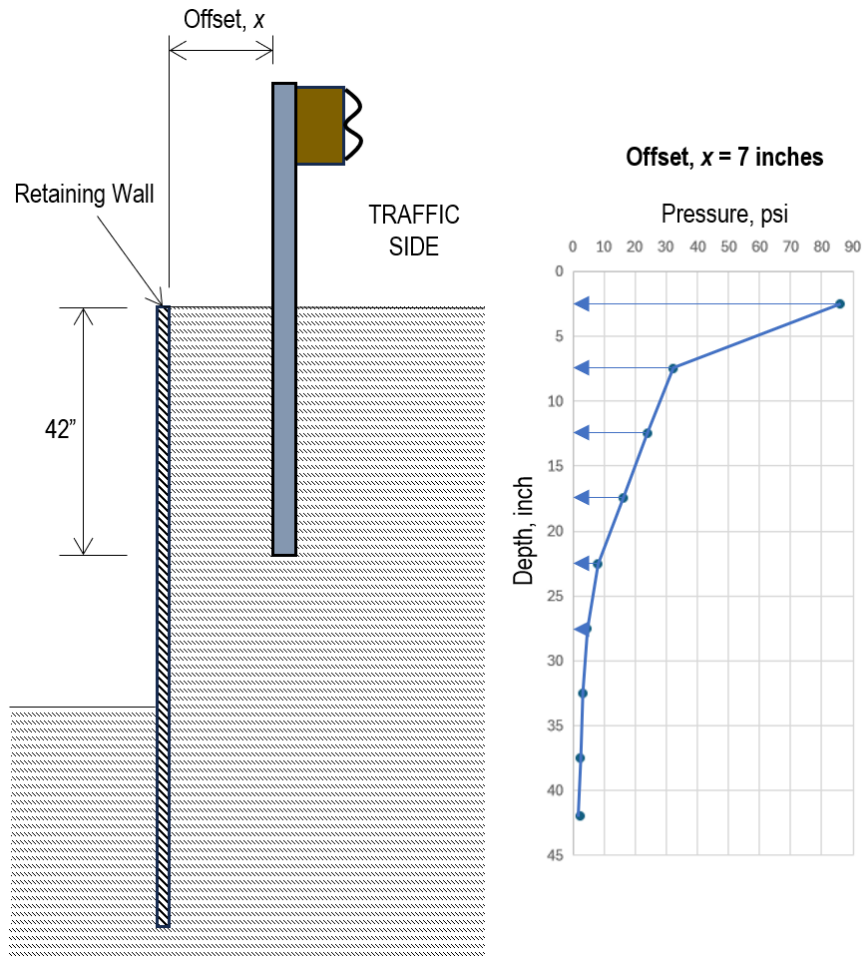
Pressure Loading on a Retaining Wall due to Impact on a W-beam Guardrail at 7-inch Offset.
